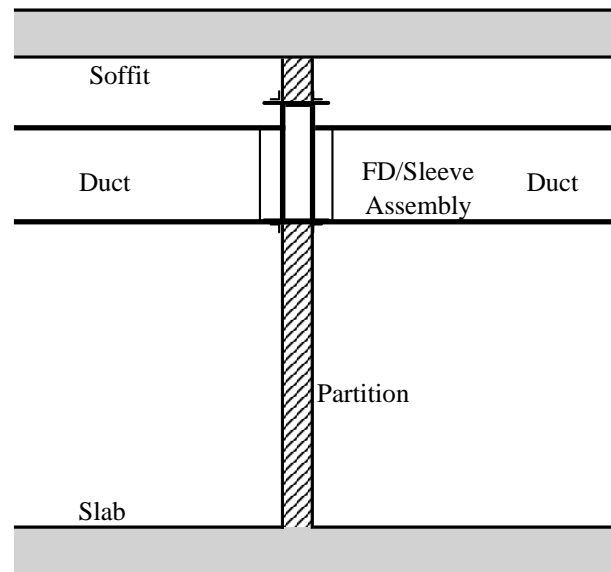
Elevation with sleeve, angle clamps, damper and duct, including breakaway duct joints, fitted to suit the pre-formed opening in the partition.
